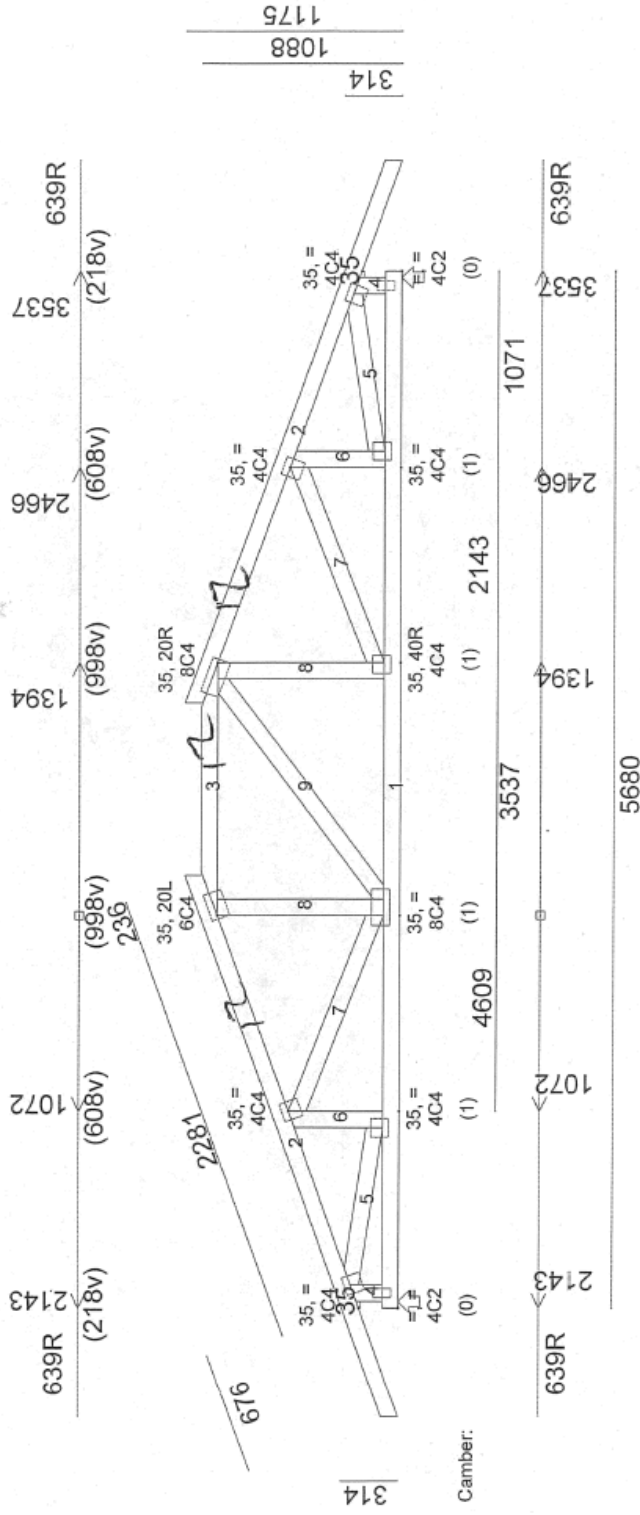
Test Cell 2 – Roof-framing Data: Truss H1 (not to scale)
